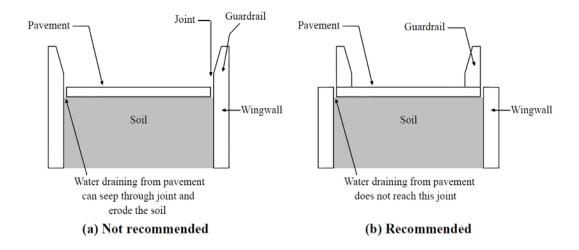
Approach slab joint details at pavement edge (Briaud et al., 1997)
